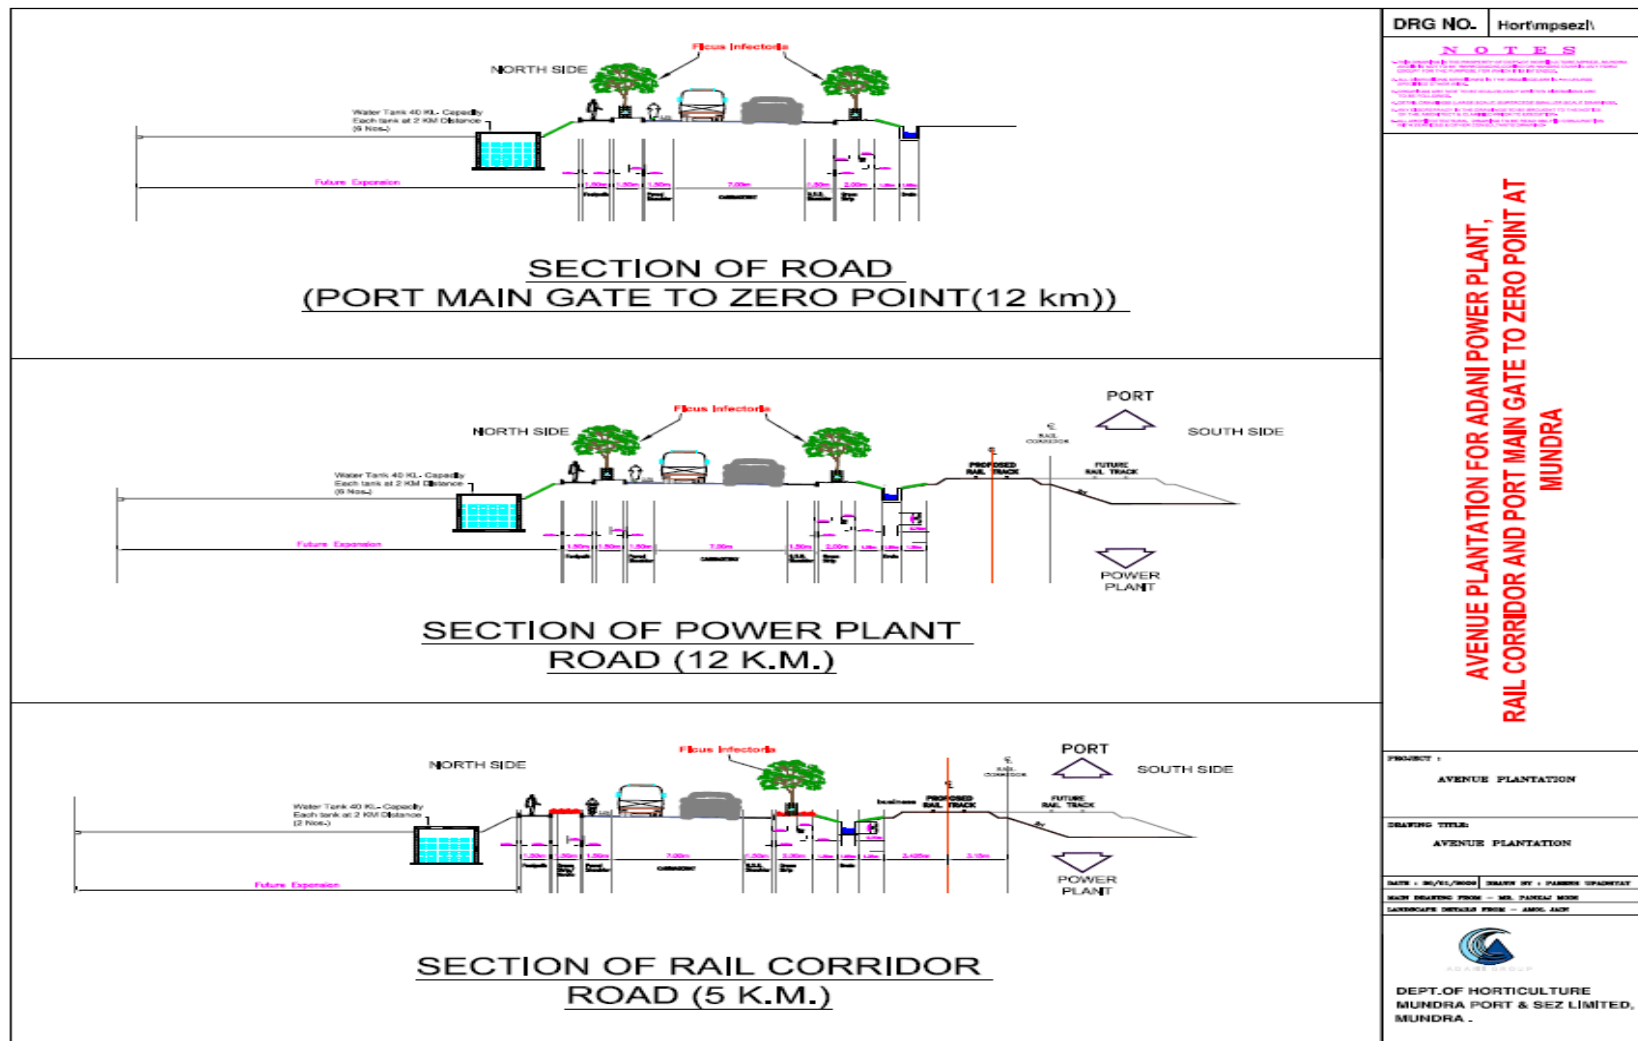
Avenue Plantation in Mundra SEZ (Road Network)
